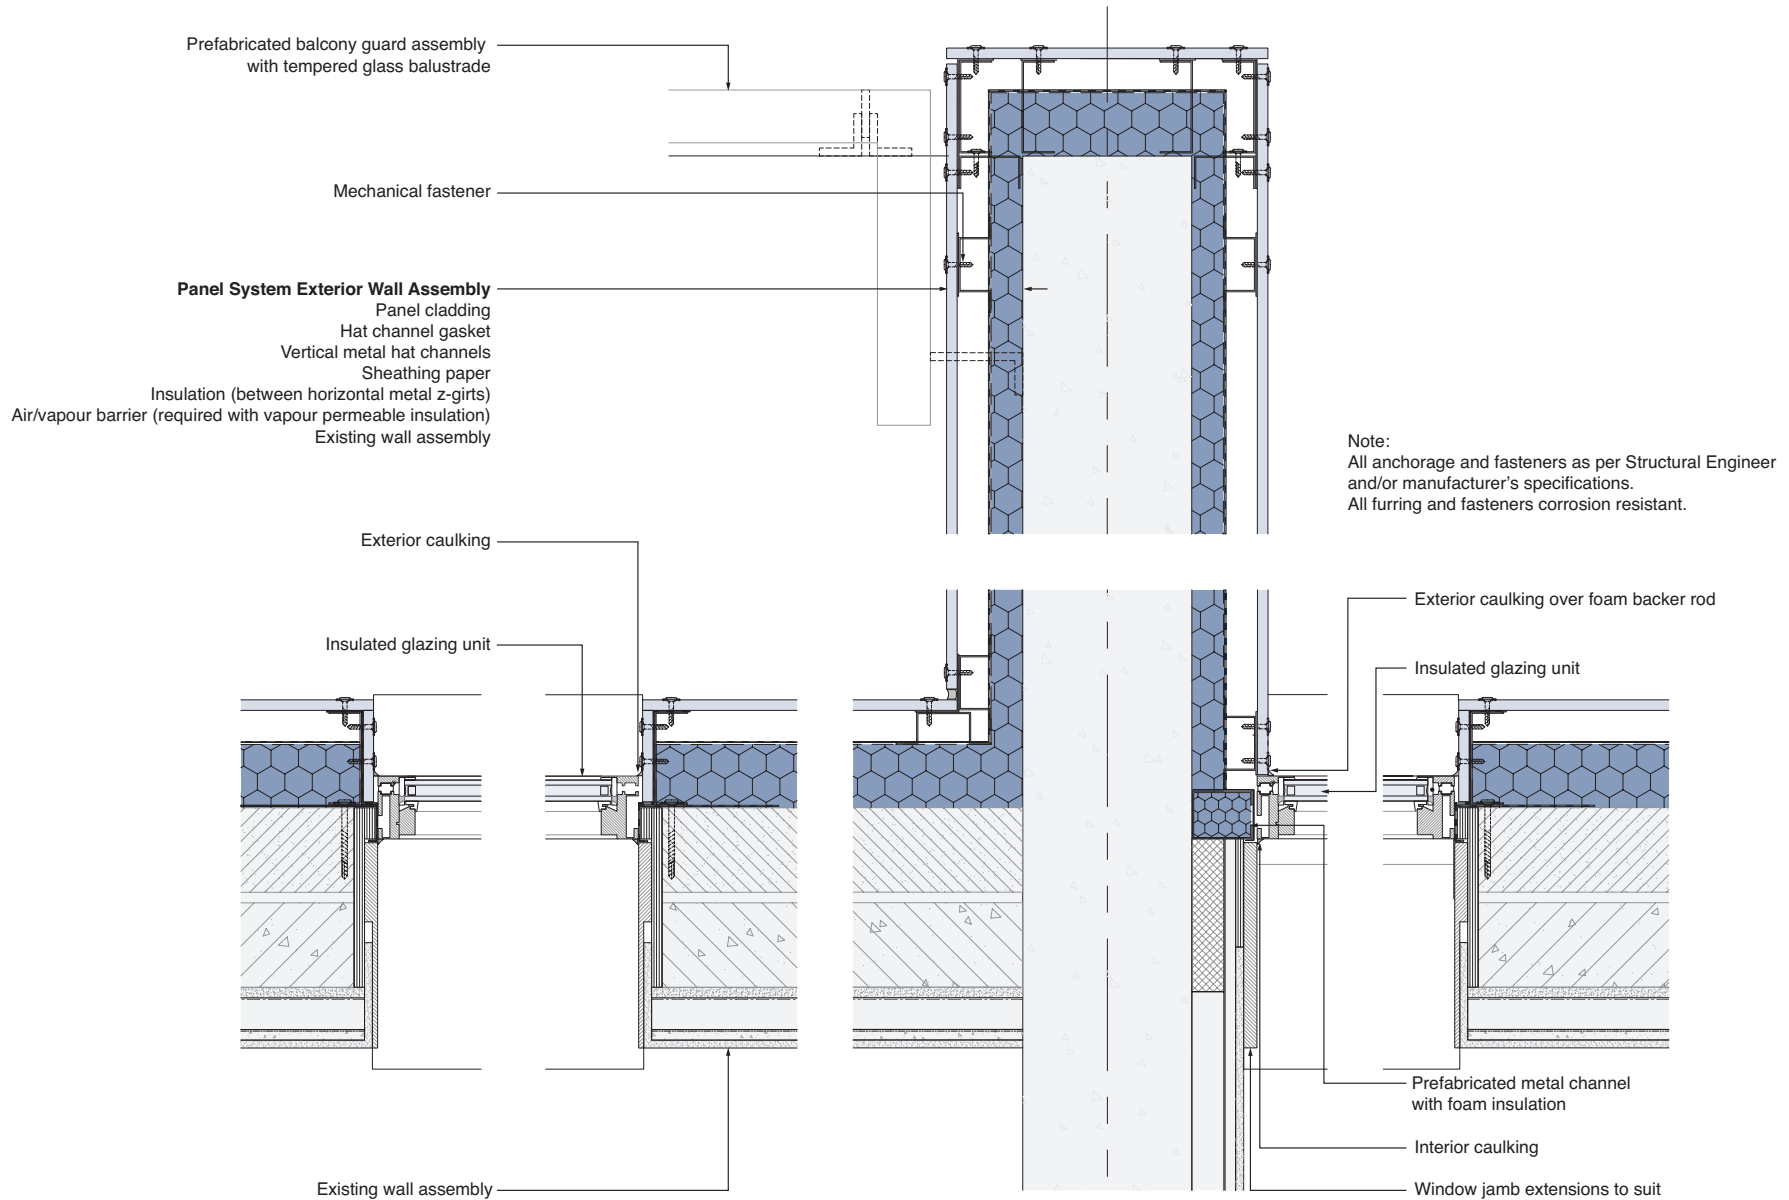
This plan detail depicts the panel overcladding of the projecting shear walls. Panel overcladding systems are well suited to the integration of building services located in the air space immediately behind the cladding panels. Two replacement window conditions are depicted. The conventional punched window appears on the left, while the window that originally abutted the shear wall appears on the right. It requires additional blocking or an adjustable bracket/channel to properly align and attach the window frame at this location. Foam sealant of the breaching to fill voids between the window and the rough opening is recommended.
